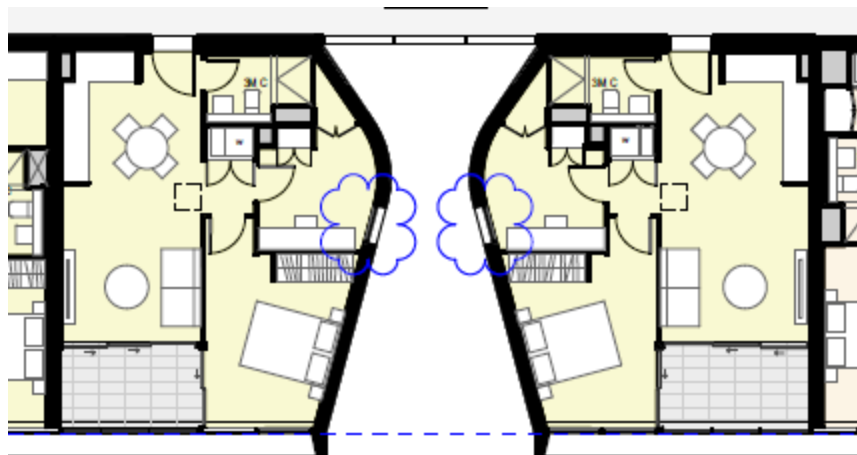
Typical example of openings on levels 6 to 29 to be windows with privacy glass (bubbled in blue). Source: Applicant's Architectural Design Report
